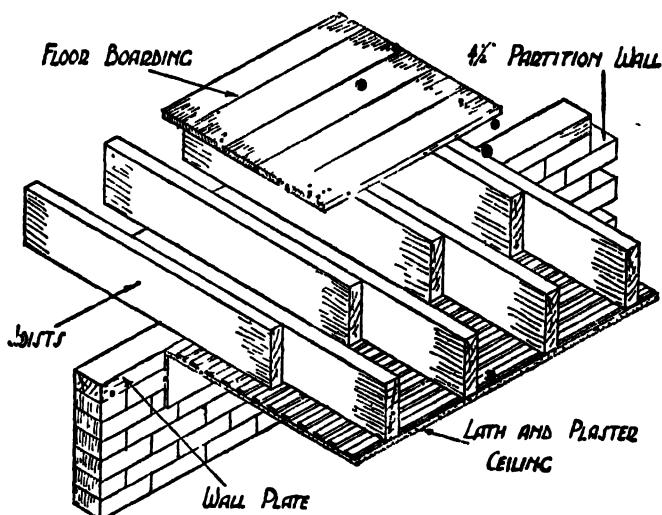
CONSTRUCTION AT UPPER FLOOR - PARTITION WALL
